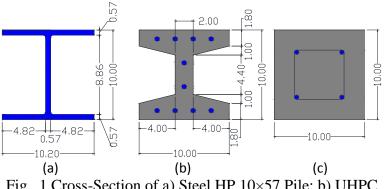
Cross-Section of a) Steel HP 10 \times 57 Pile; b) UHPC Pile; and c) 10 \times 10-in. Normal Concrete Pile (all dimensions are in inches)
